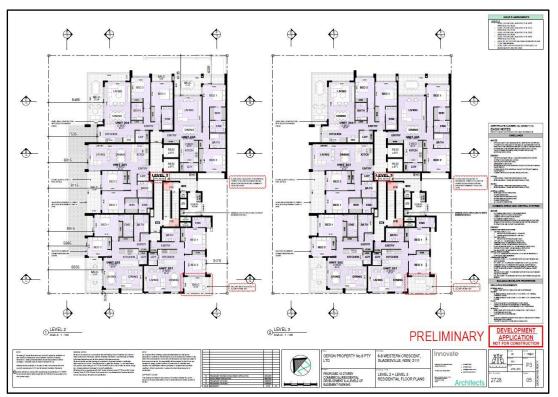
Proposed Level 2 + Level 3 Residential Floor Plans
